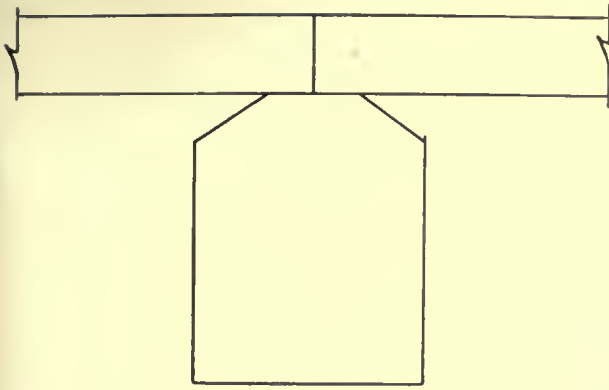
Section through roof plank and beam showing a method for retarding rotting over beams.
